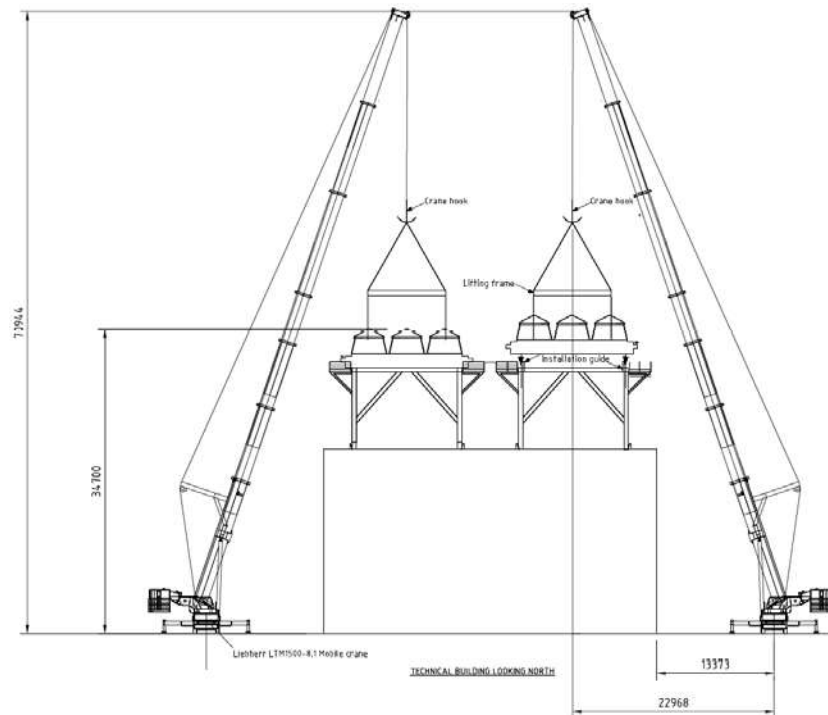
Lifting of Cooler Bays Onto the Technical Building Roof
